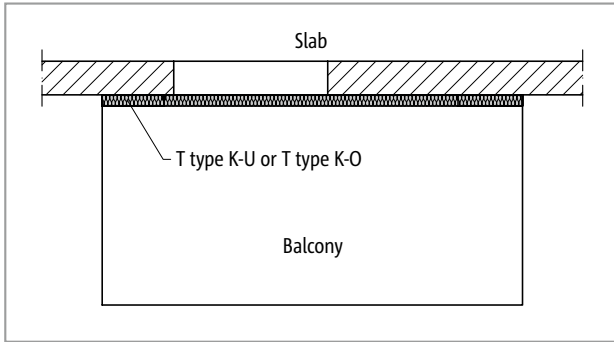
Schöck Isokorb® T type K-U/K-O: Cantilevered balcony
